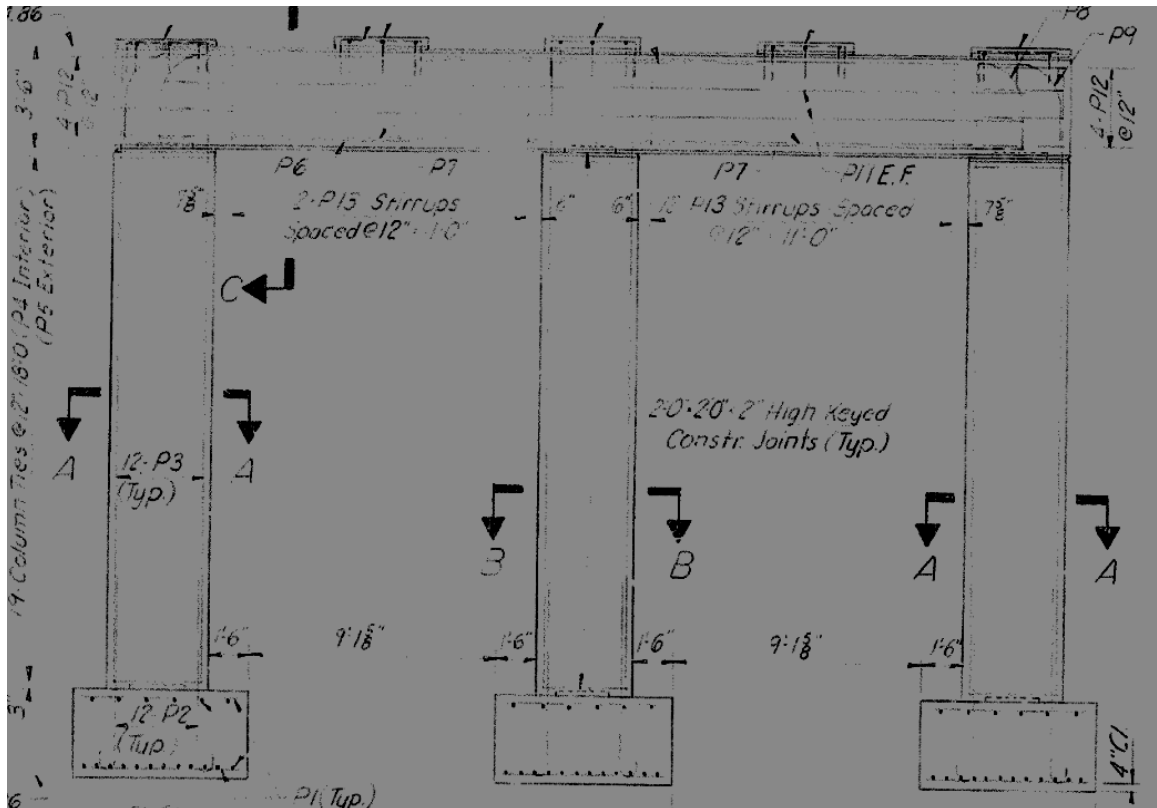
Elevation of pier and footings (excerpted from structural drawings).
